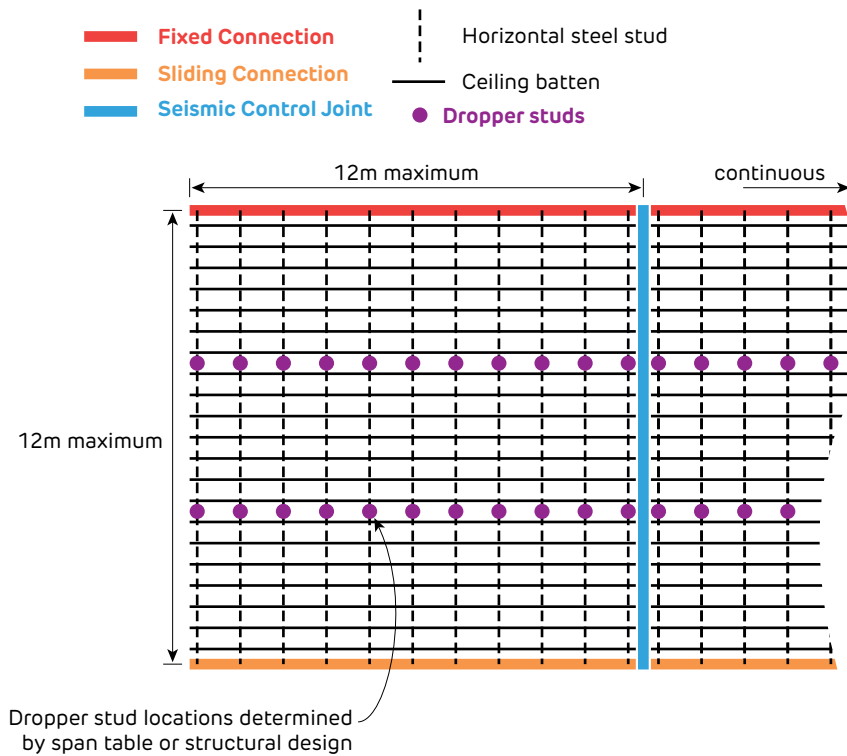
Stud Ceiling Type A3 - Fixed / Sliding
